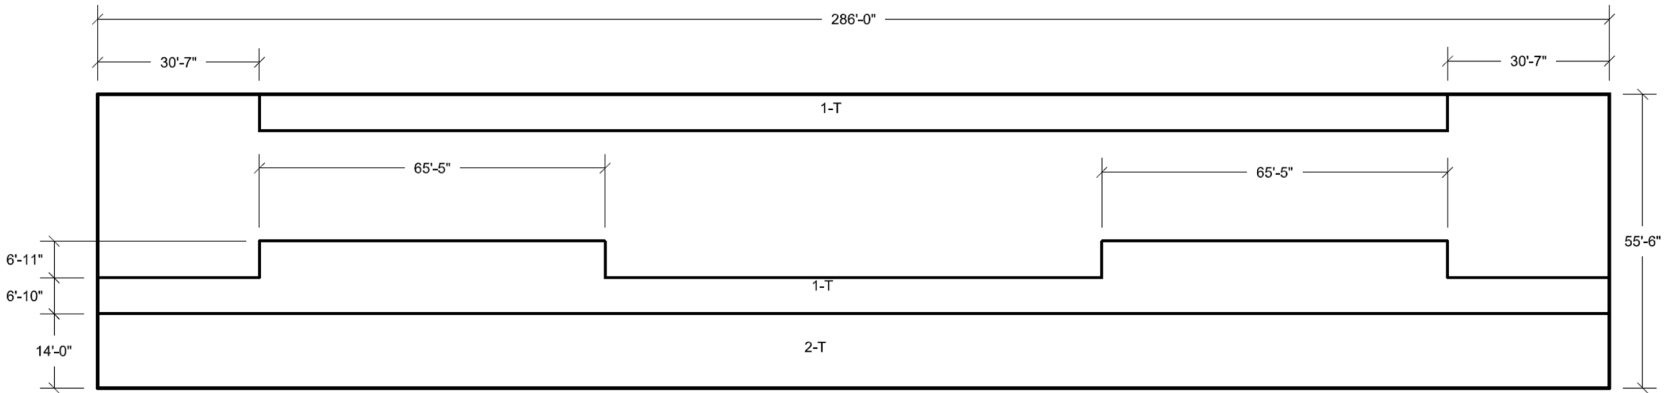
H.6-112 Cooling Tower North (and South) Wall Looking South (North)
